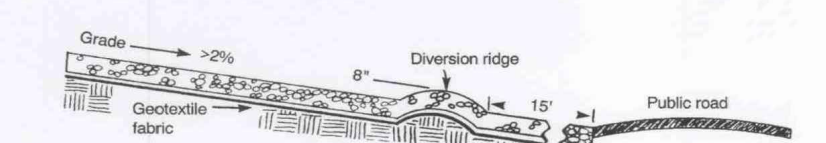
Cross-section of a Construction Entrance/Exit (NC, 1993)
